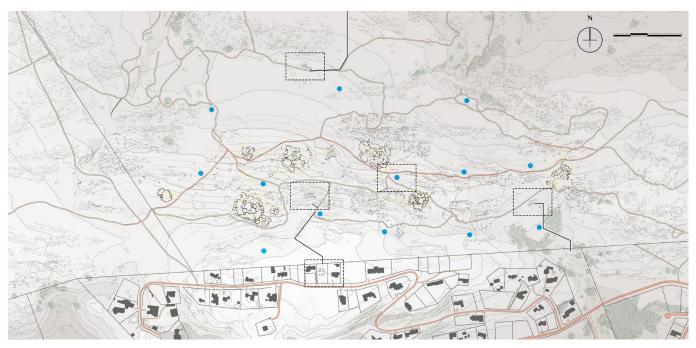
A site map indicating the five sites of building placement (Author, 2021).
